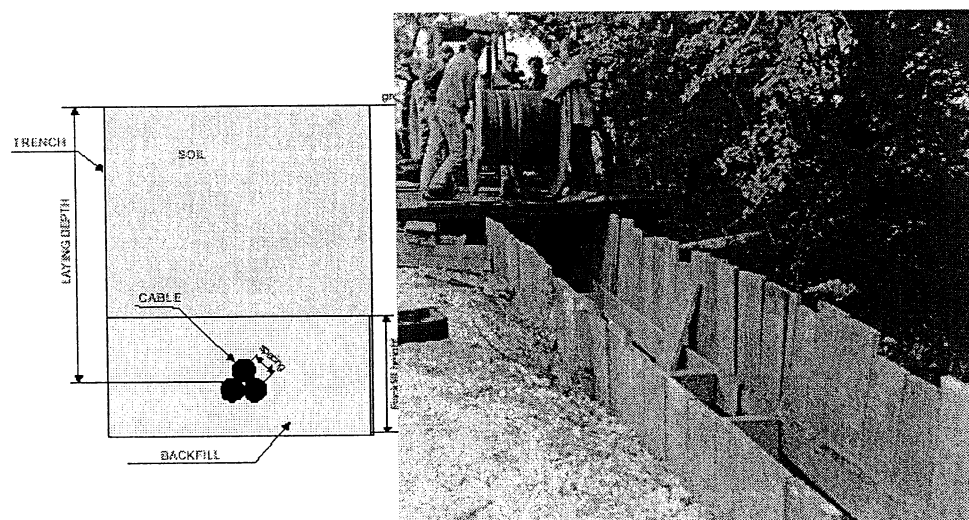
Trench cross-section and construction activity for a high voltage (66-90 kV) cable
